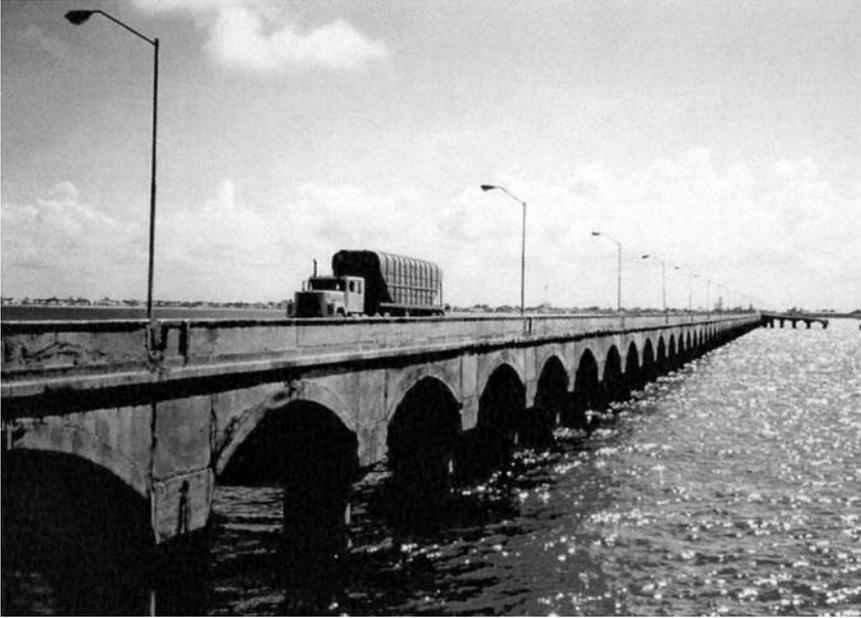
Remaining parts of a concrete pier built in a conventional way on the Yucatán Coast in Mexico in the 1960s (source: Courtesy of Rambøll Consulting Engineers).
